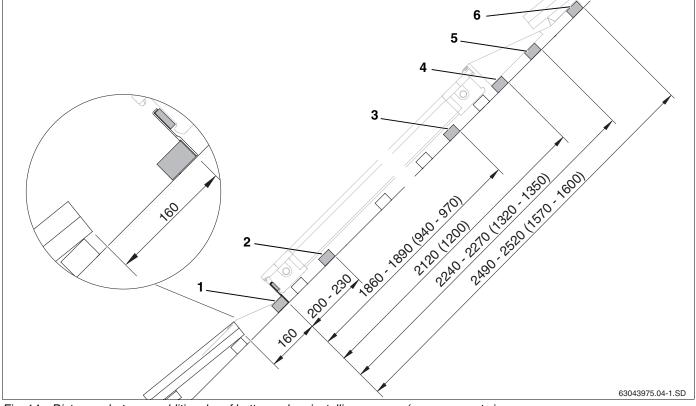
Distances between additional roof battens when installing one row (measurements in mm, values in brackets = landscape version)
